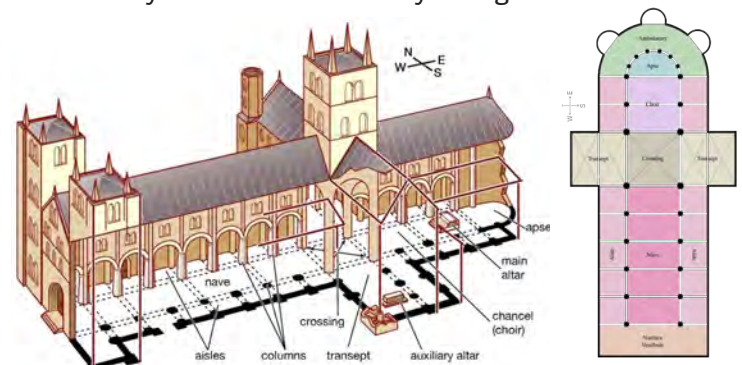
Figure V Exterior floor plan of a Medieval cruciform cathedral (left) and interior floor plan of a typical Western European cathedral (right).
